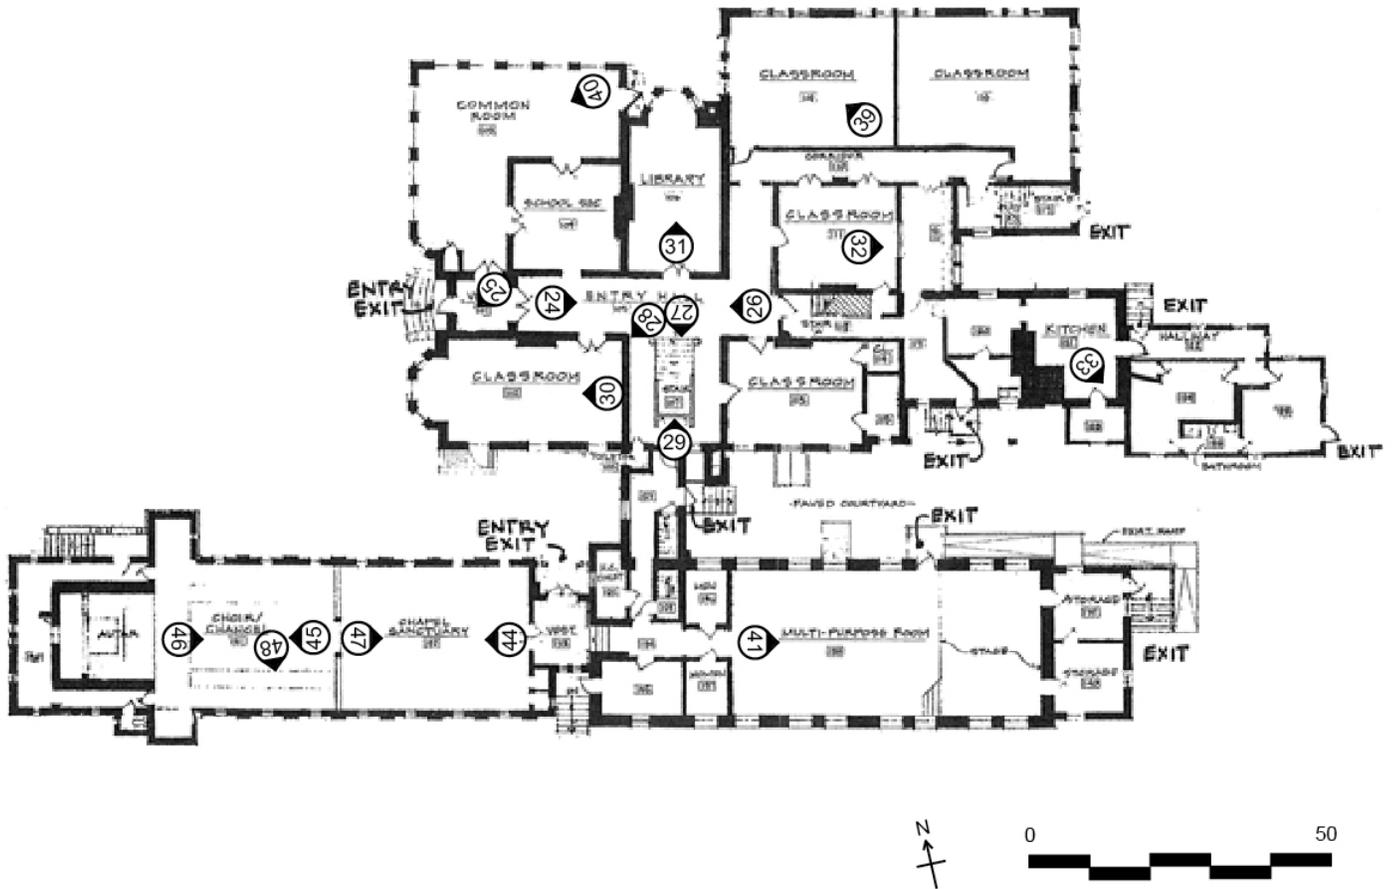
Figure E. Classroom Complex—Existing Conditions—First Floor Plan Keyed to Photographs.
